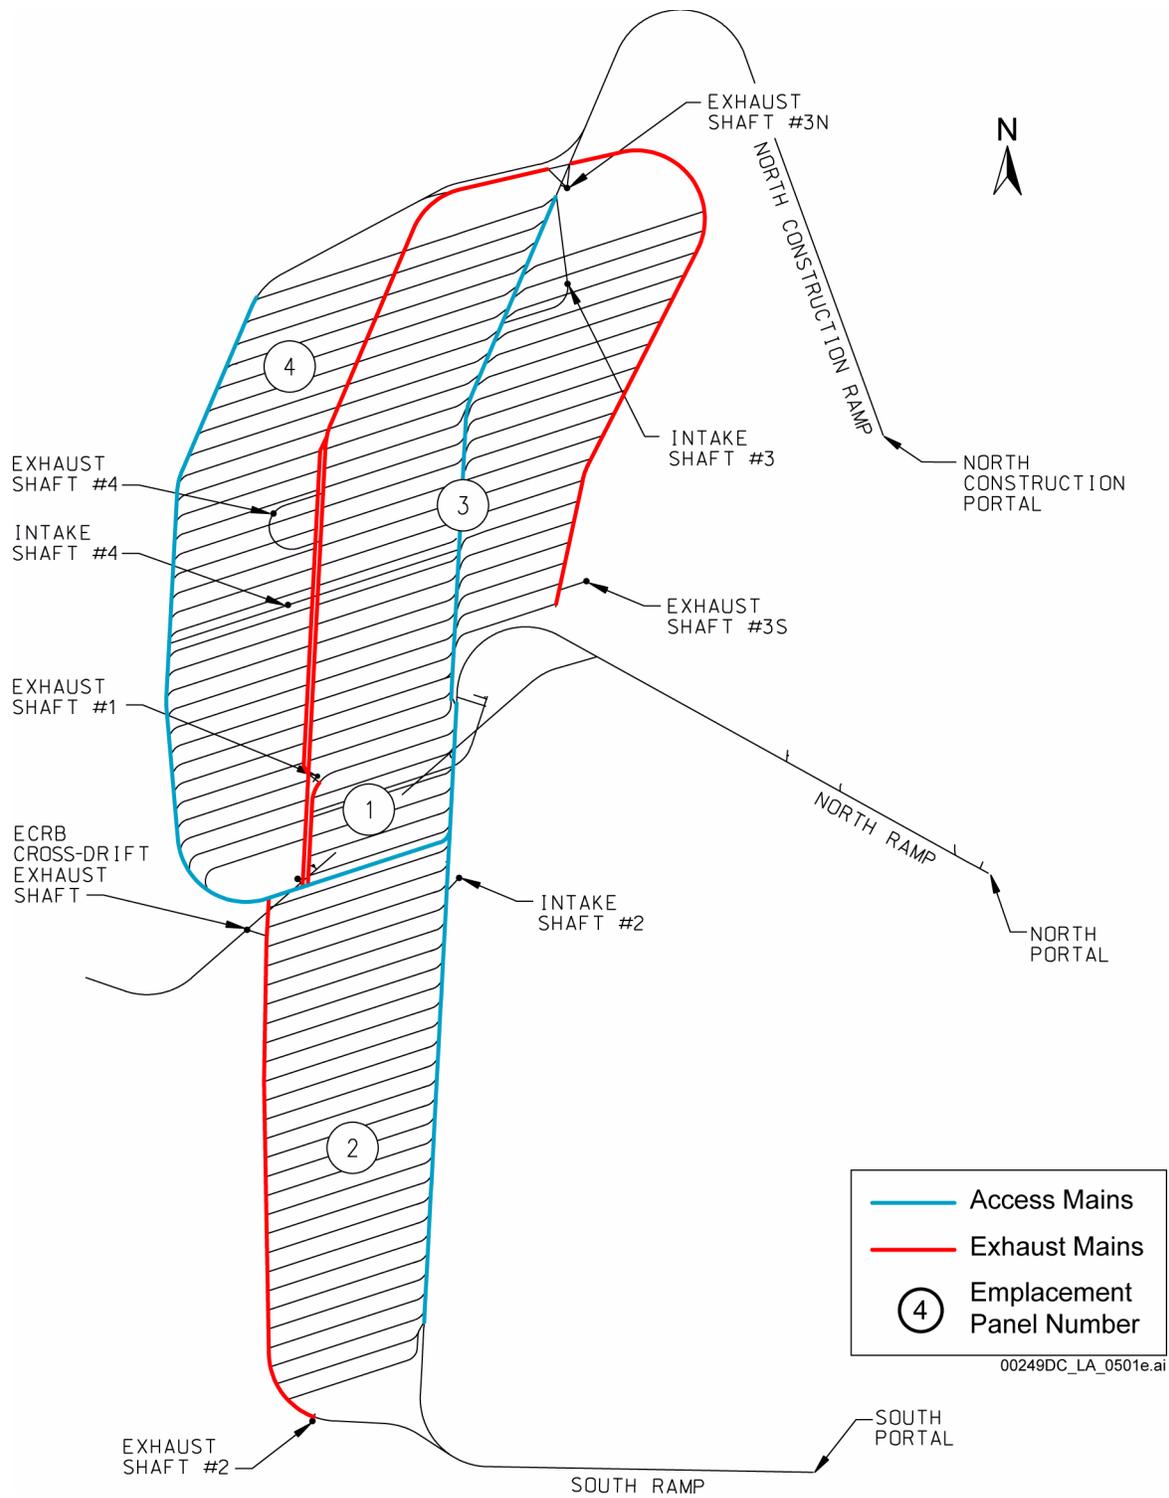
Underground Layout and Location of Ramps and Shafts
